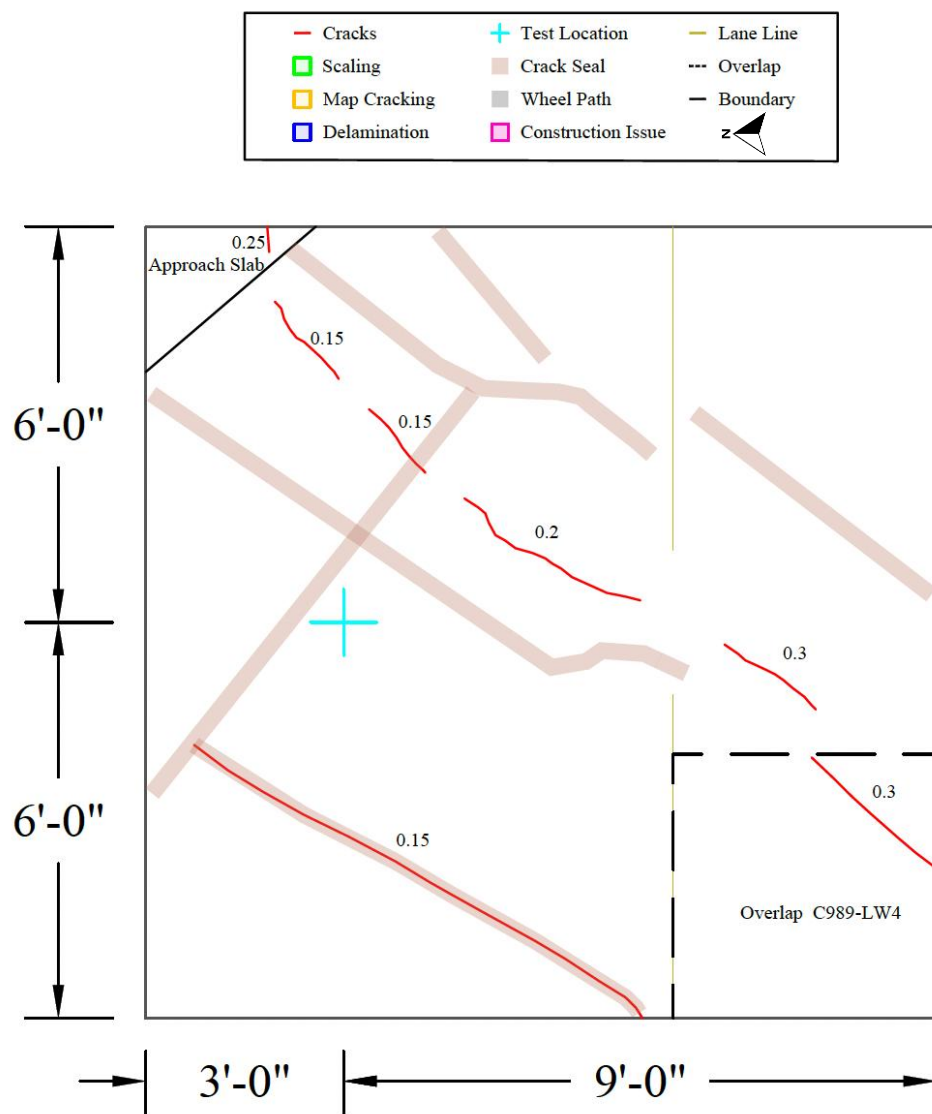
Test location 5 of lightweight concrete deck at bridge C-989.
